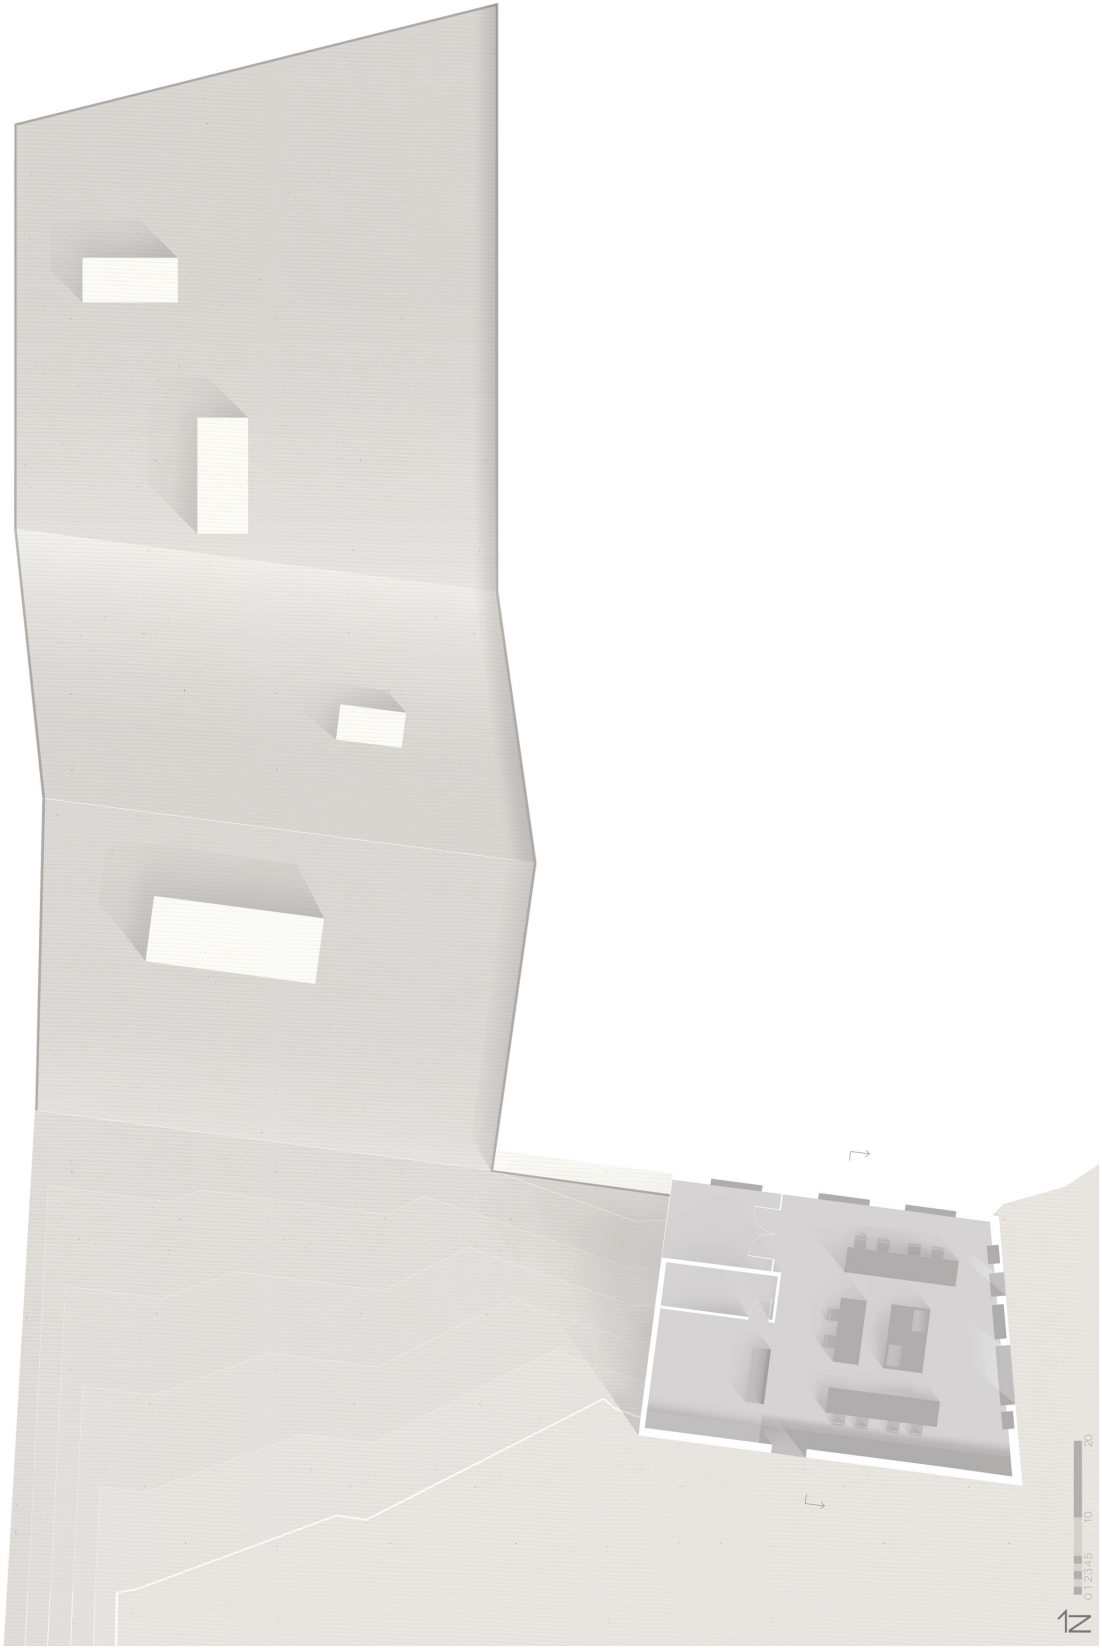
Plan of the workshop (level 3) and greenroof of the store.
